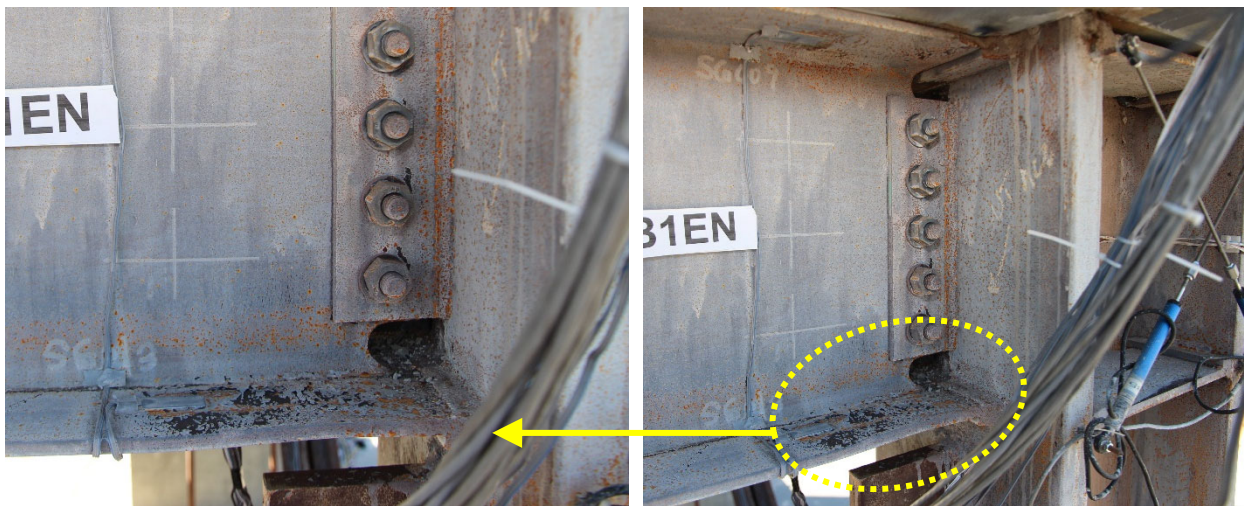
After Test 2B-5: Yielding and Local Buckling of Bottom Flange at North 2<sup>nd</sup> Floor AFW Collector-to-Column Connection
